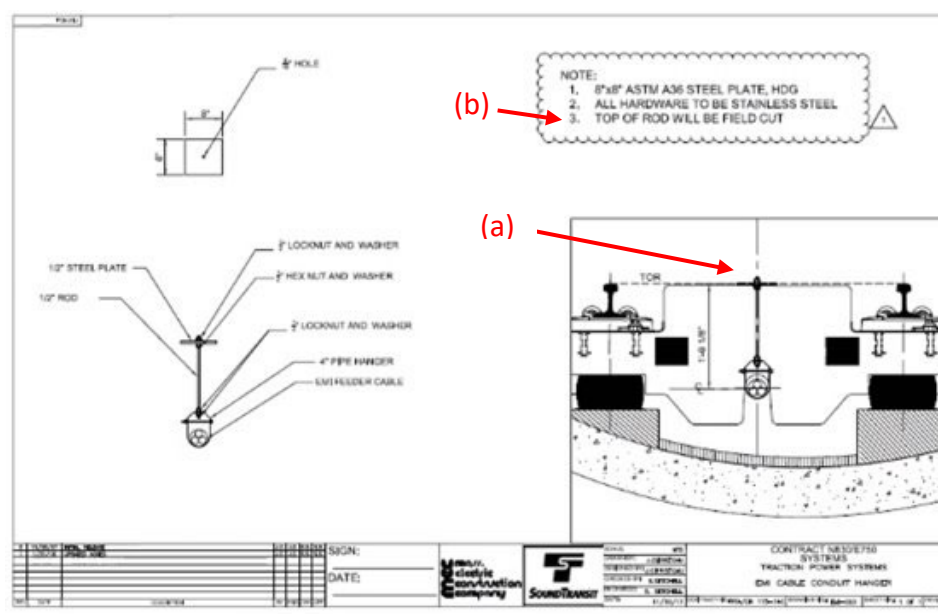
Shop Drawing of the EMI Feeder cable, along with the floating slab; showing (a) the EMI bolt and rod protruding TOR, and (b) that the rod needed to be field cut modified in red by Audit Division)
